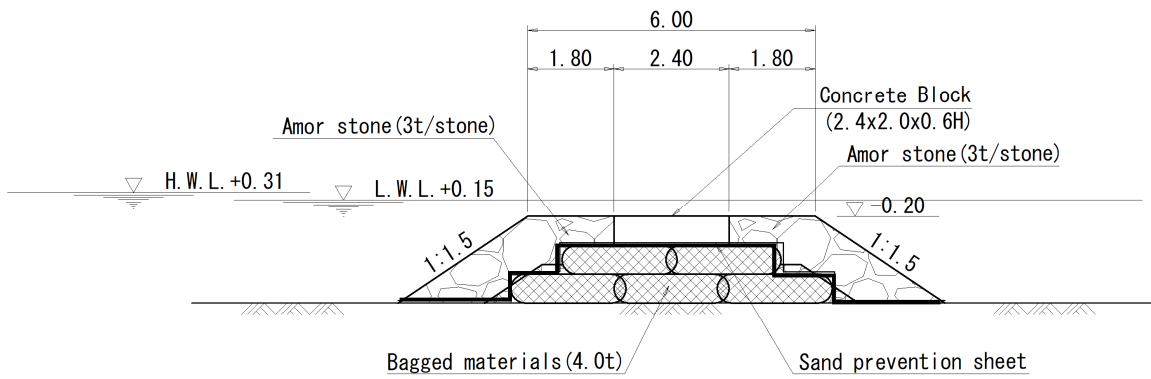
(6) Typical cross section drawing of submerged breakwater (completed)
